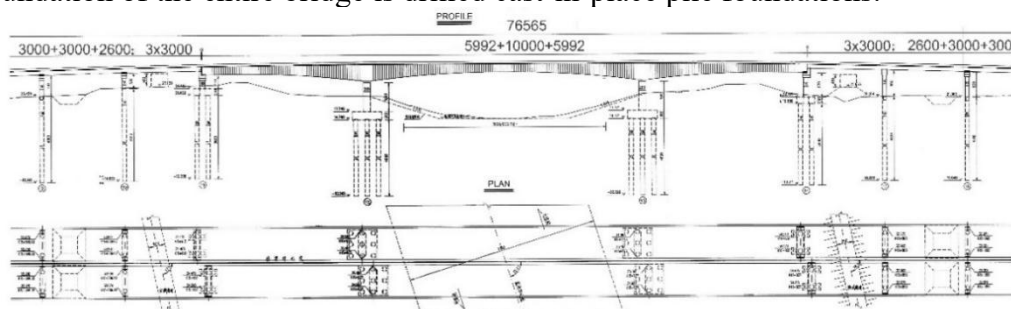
Bridge scheme, Plan and Profile (unit: cm)
